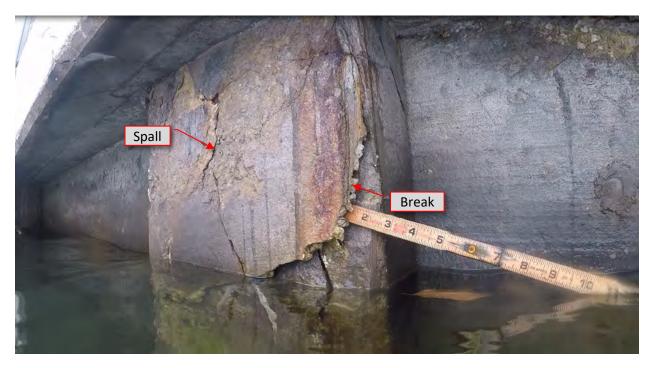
P32. STA 5+16. Cracks/spalls at both flanges and south face, loss of concrete, and rust staining.
